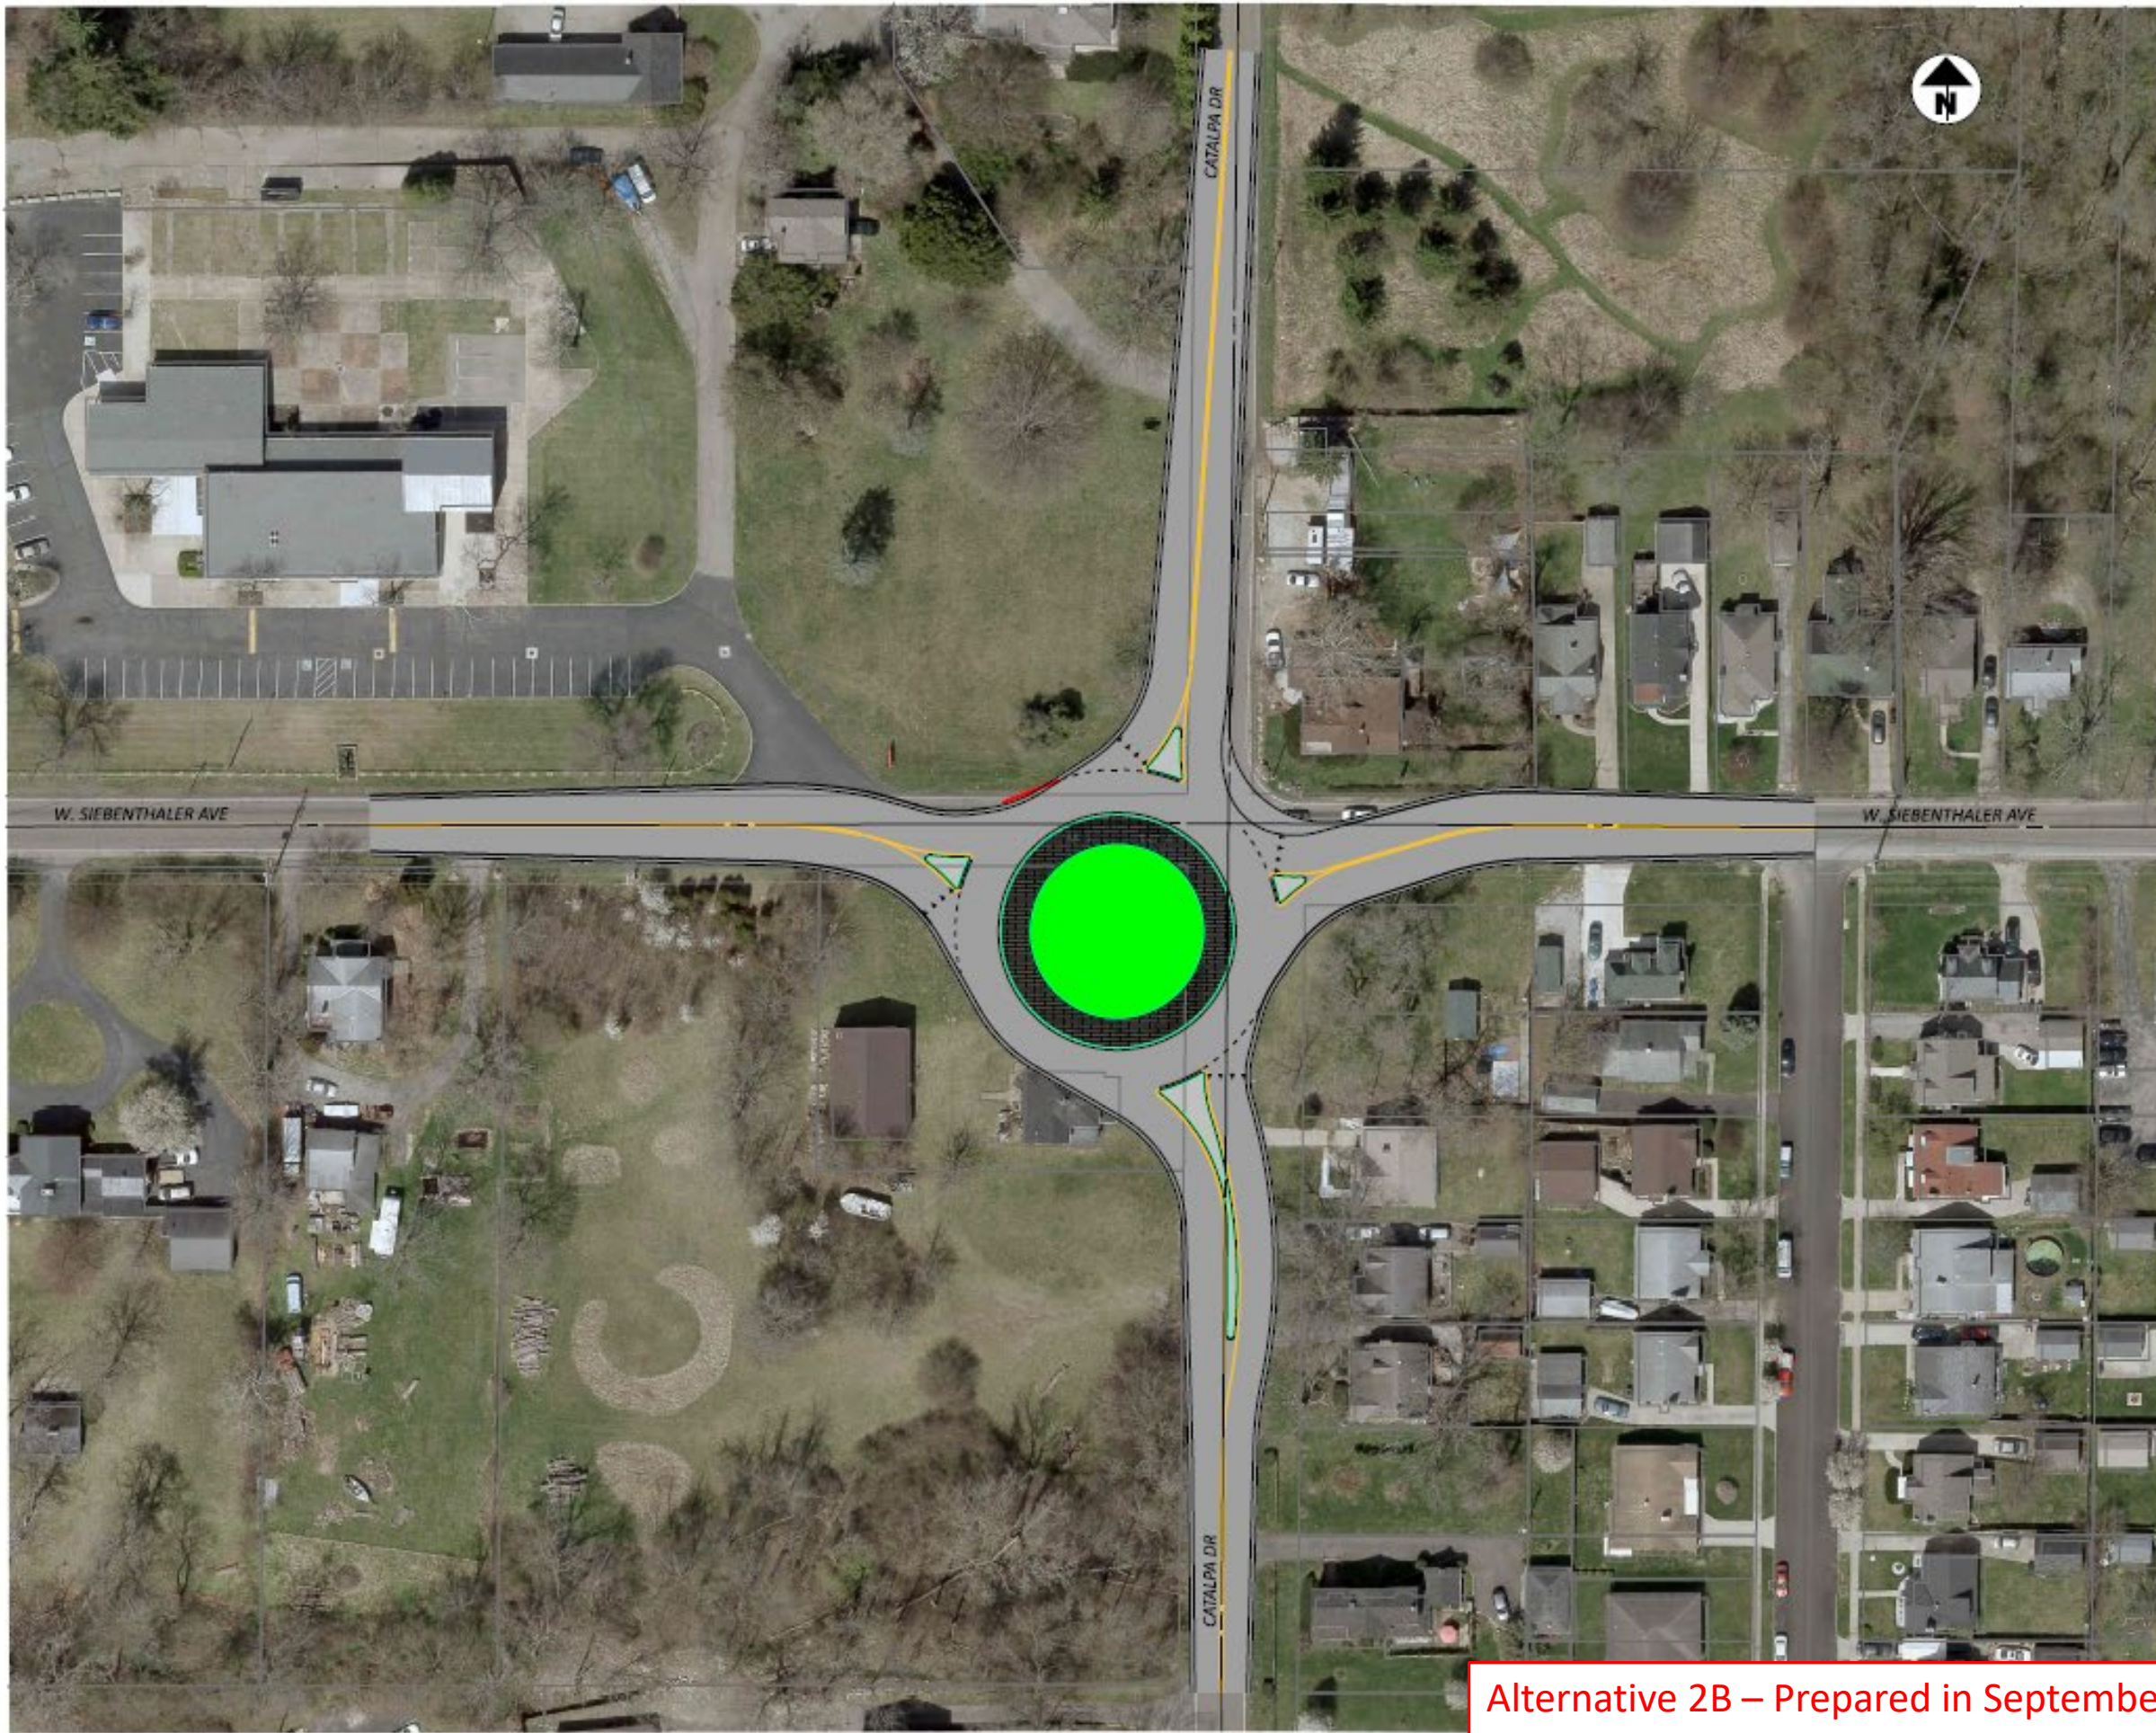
CONCEPT PLAN (ALTERNATIVE 2)
